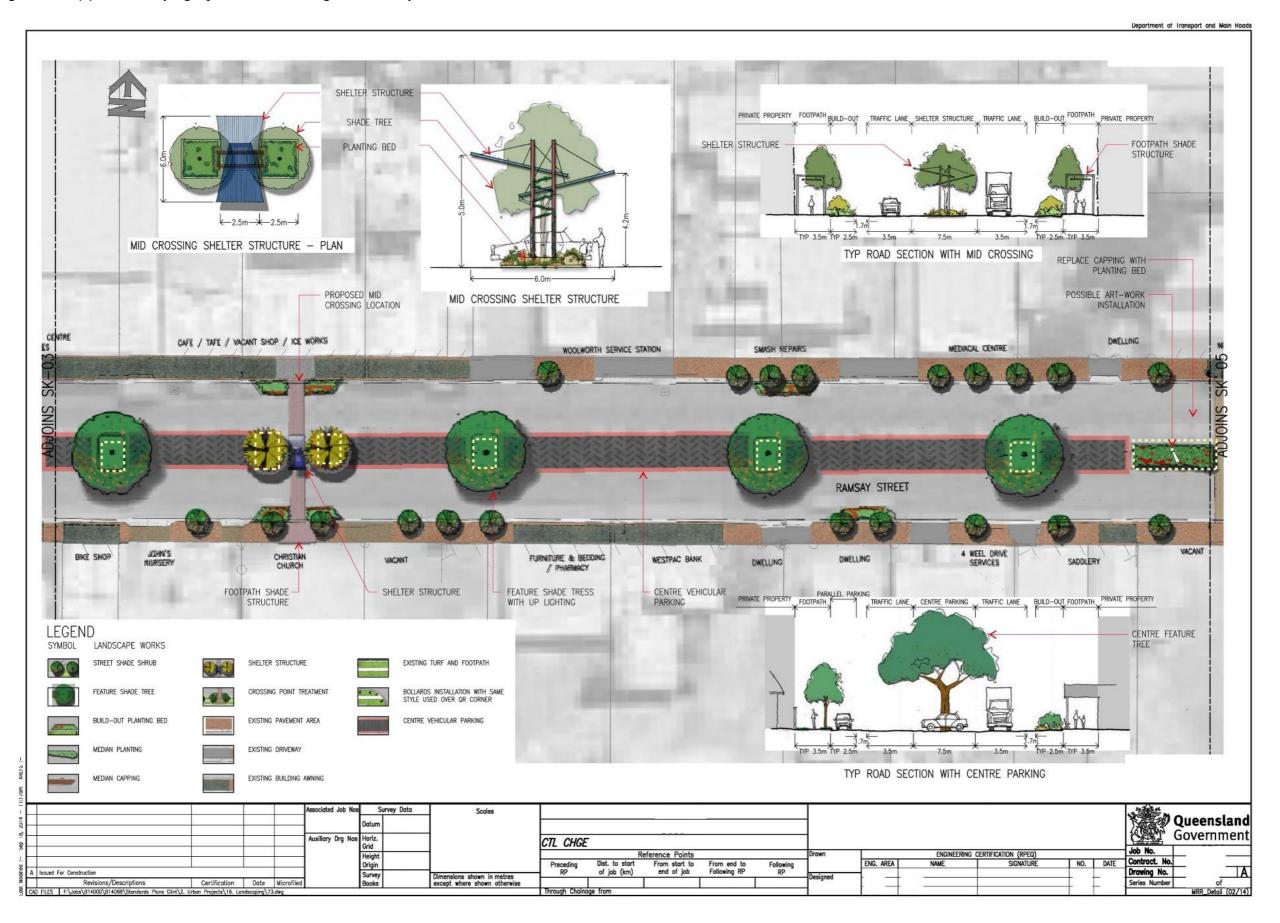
(c) – Landscaping layout and details – generic example 3
